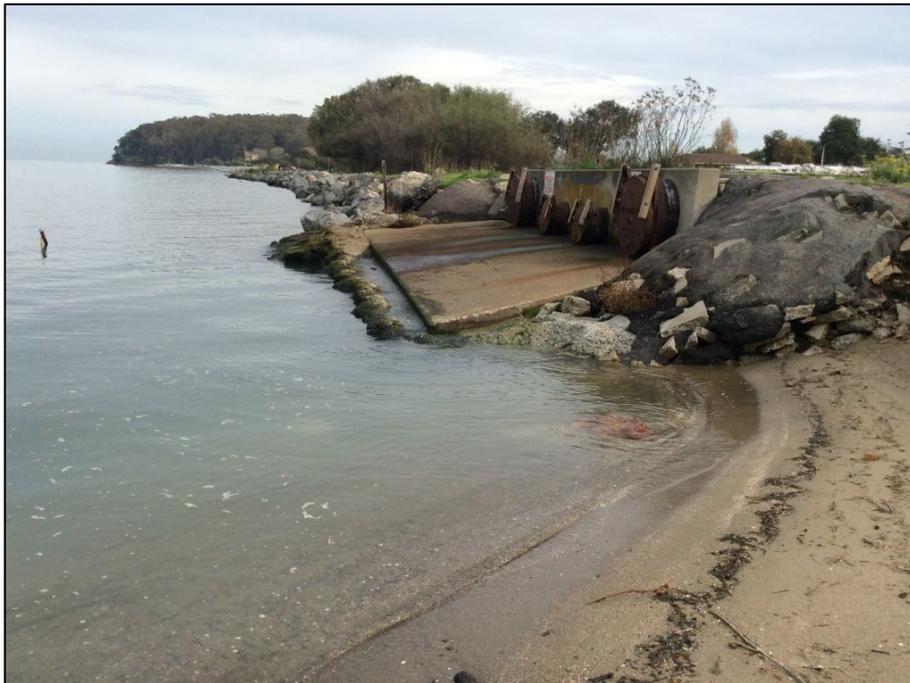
Culvert outlets (C1) to the San Francisco Bay. This photo was taken in December 2014.
